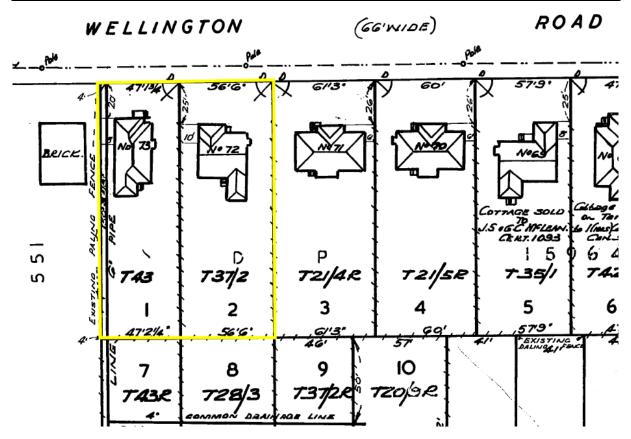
Layout Plan (circa 1946) showing Subject Site Source – LAHC
